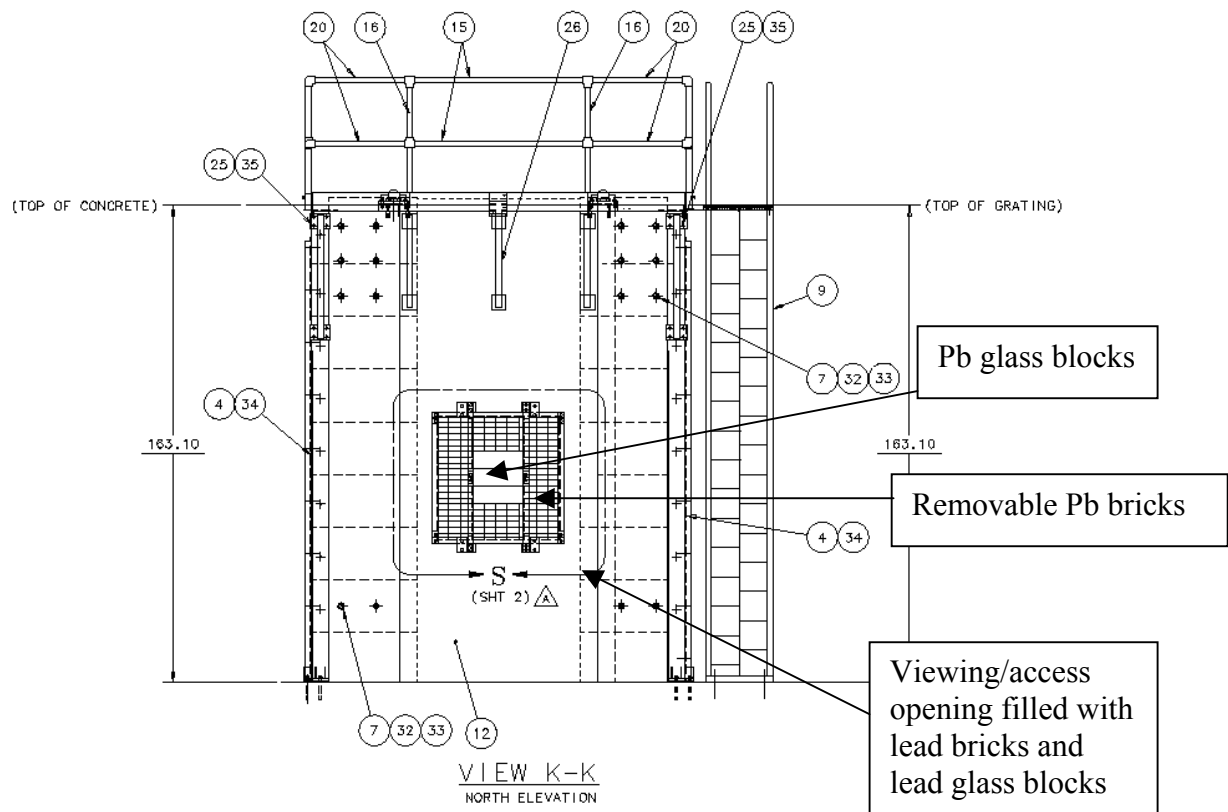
North end elevation of the Hot Cell assembly.
